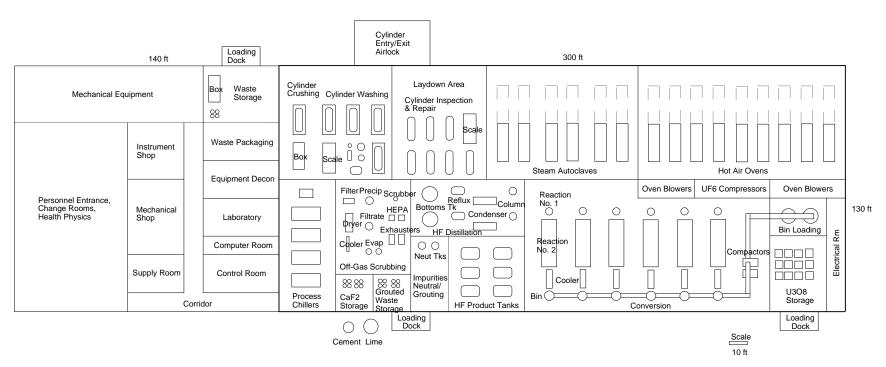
Process Building General Arrangement Conversion to U3O8 and AHF (15 yr)
